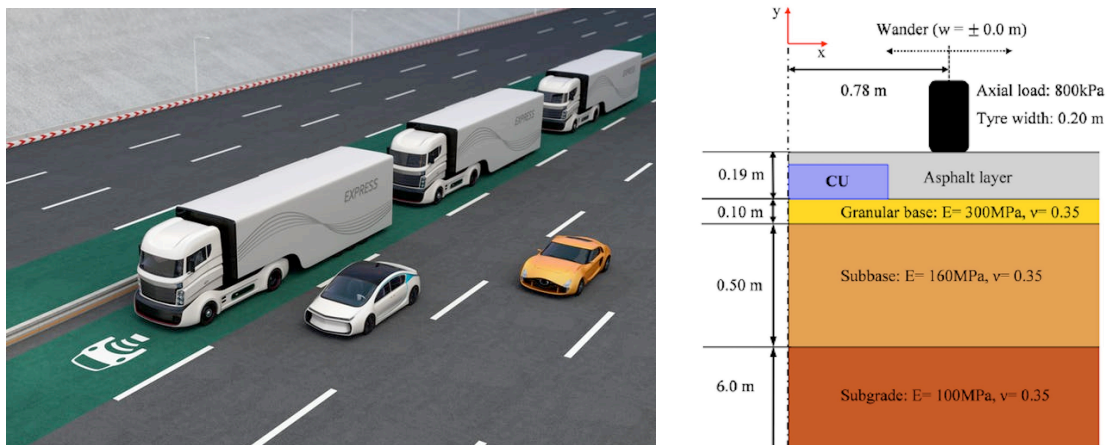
eRoads examples (Left) Wired-up roads (from [2]); (Right) Half cross-sectional geometry of an asphalt eRoad with a Charging Unit – CU (from [3])
